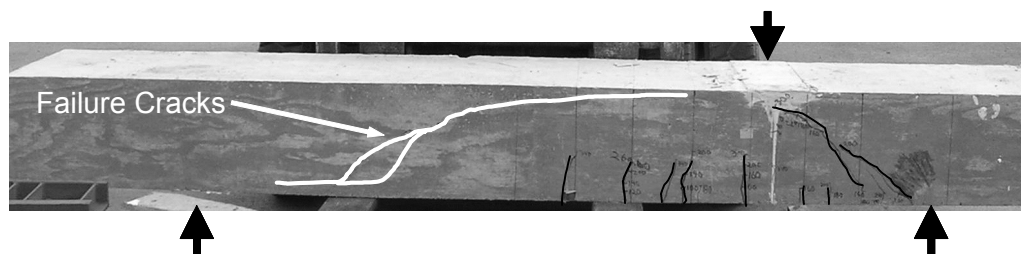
Typical failure of South shear span (II-W-E-5.8-8)
